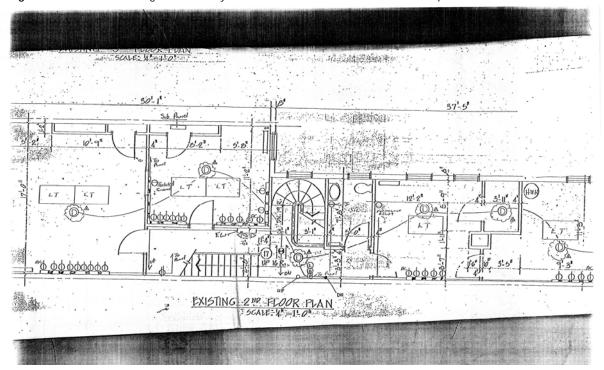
Permit drawings submitted by Princeton Electric, 5/19/1989; second floor plan.
